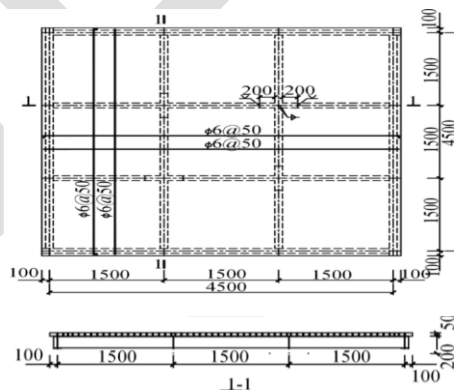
Overall view of specimen (dimensions in millimeters) [8]
